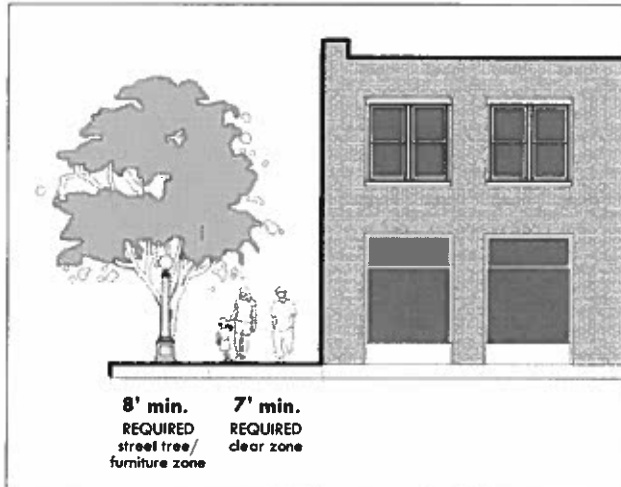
NBG Core Transit Corridor sidewalk requirements.
